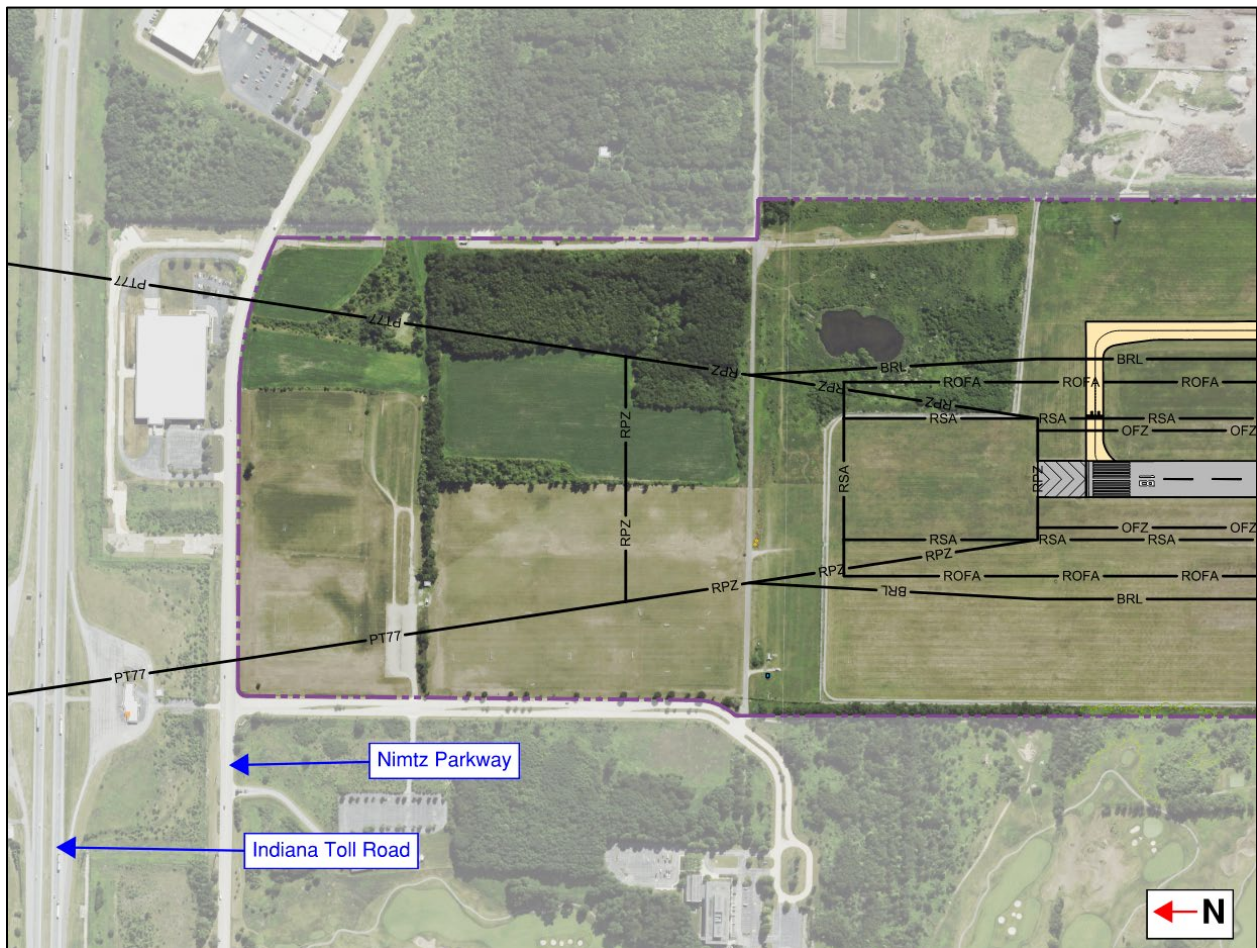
Constraints to a Runway Extension at Approach End of Runway 36
